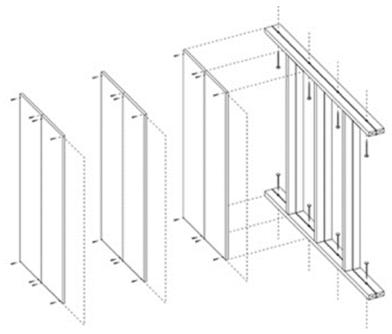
EXAMPLE OF WOODEN STUD CONSTRUCTION WITH COUPLED WOODEN FRAMES. THAT CAN BE DISASSEMBLED AND REUSED OVER TIME. ©ZHAW
